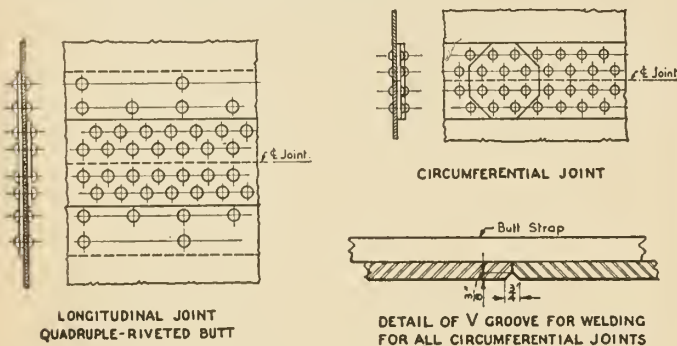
Detail of Riveted and Welded Penstock Joint.
